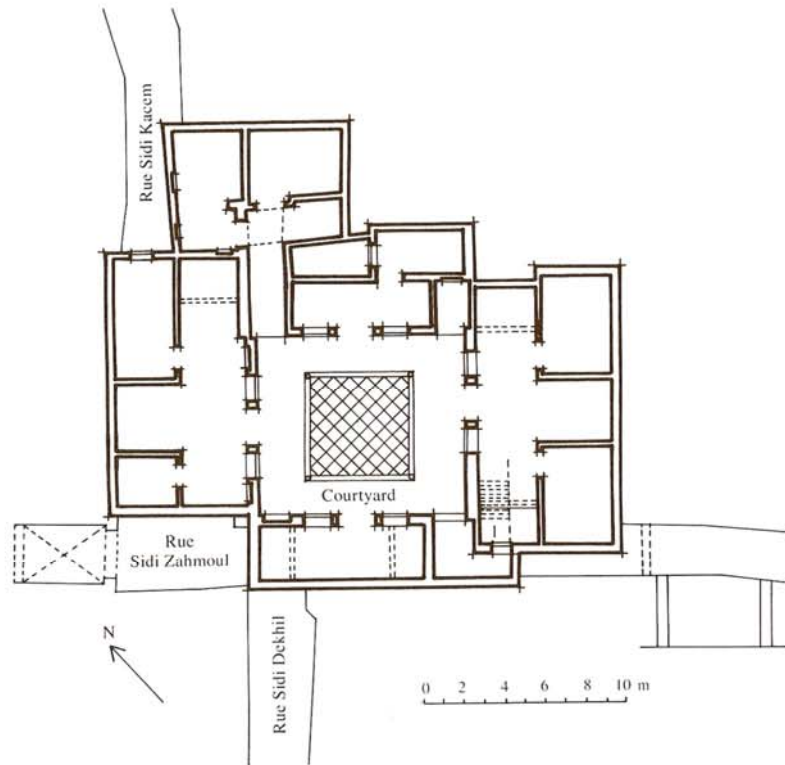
Plan of Dar Lajimi, a courtyard house, Tunis. (See p. 63.)
